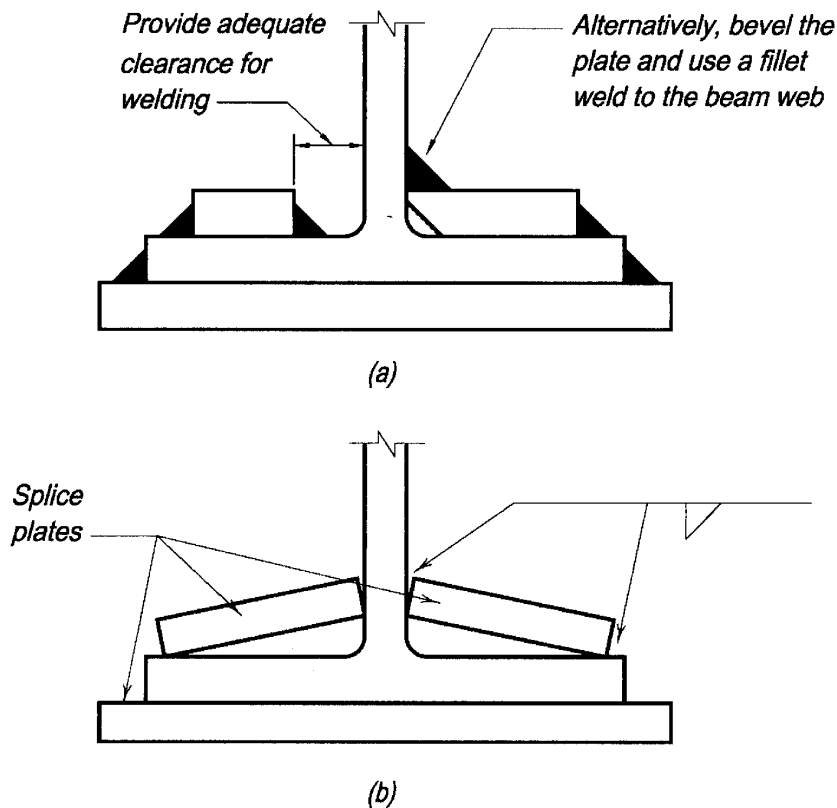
Welding clearances for flange-plated moment splices.
